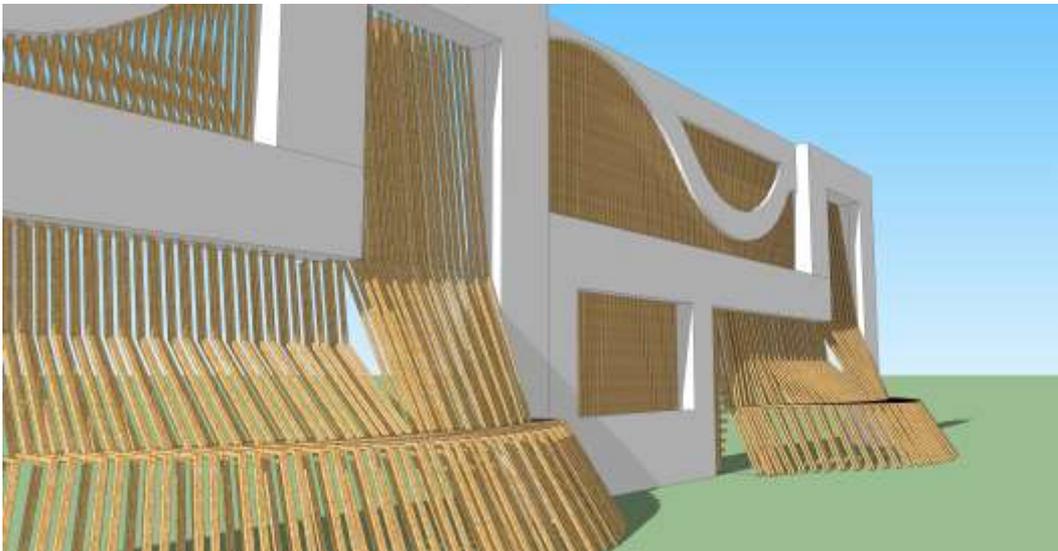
PROPOSED WALL CONCEPT FOR THE ENGINEERING DEPARTMENT OF THE MINISTRY OF EDUCATION
